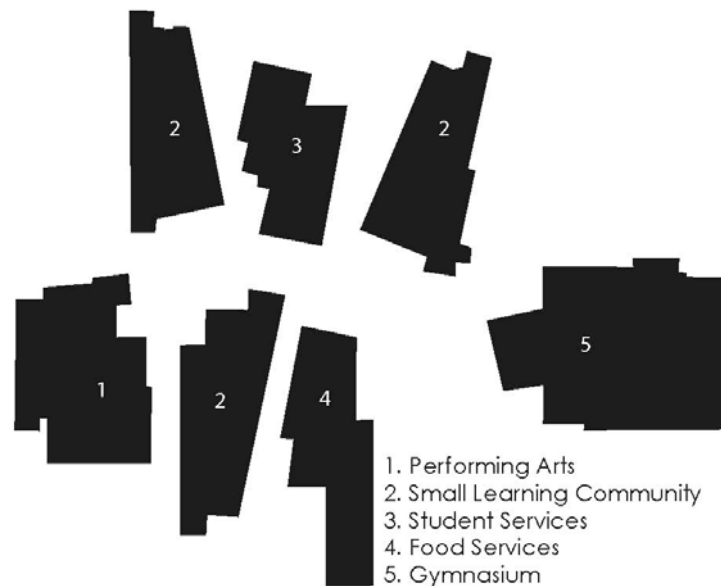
Campus plan based on the Partial Site Plan developed by DLR Group. Image adapted from "College Prep: A Small School Approach to Education Yields a Campus Plan for a Quickly Growing District, by T. S. Bowen, n.d., Retrieved from http://archrecord.construction.com/schools/08_Betty-Fairfax.asp
